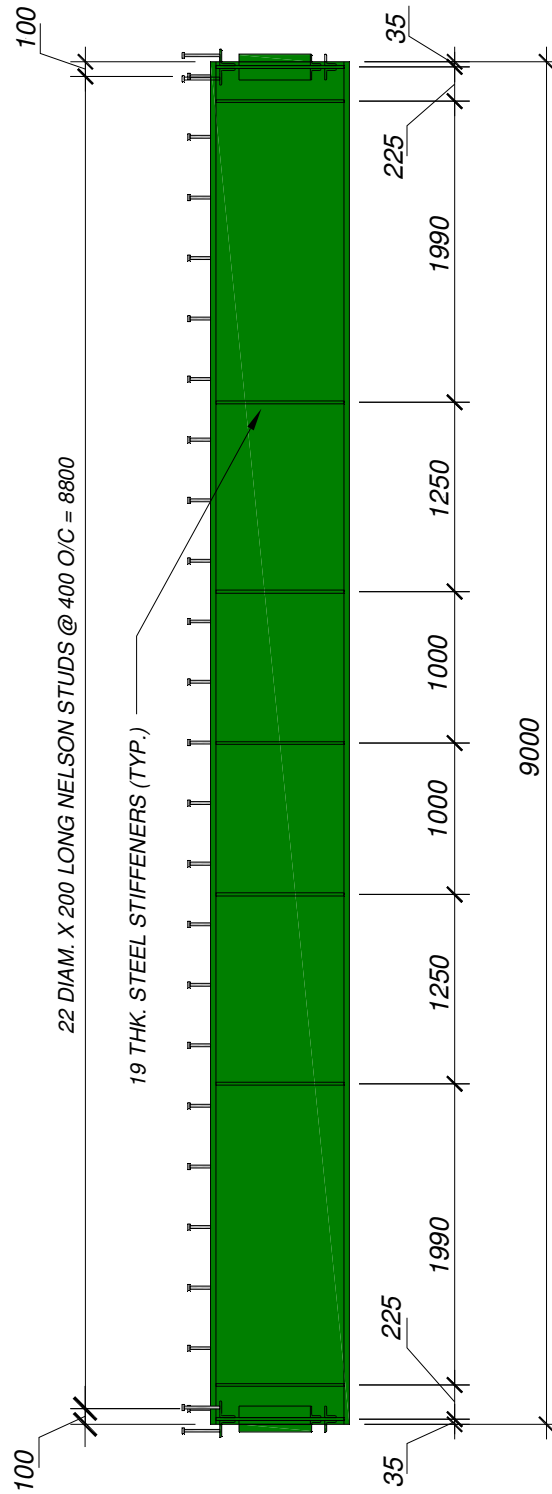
(b): Elevation view of the steel girders and end diaphragms
